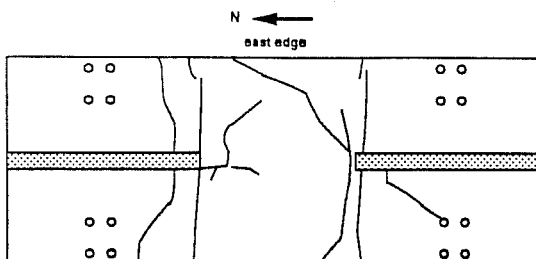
Sp. 2b: Progression of Cracking of Top Face of Second Floor Slab at Load Point 177
